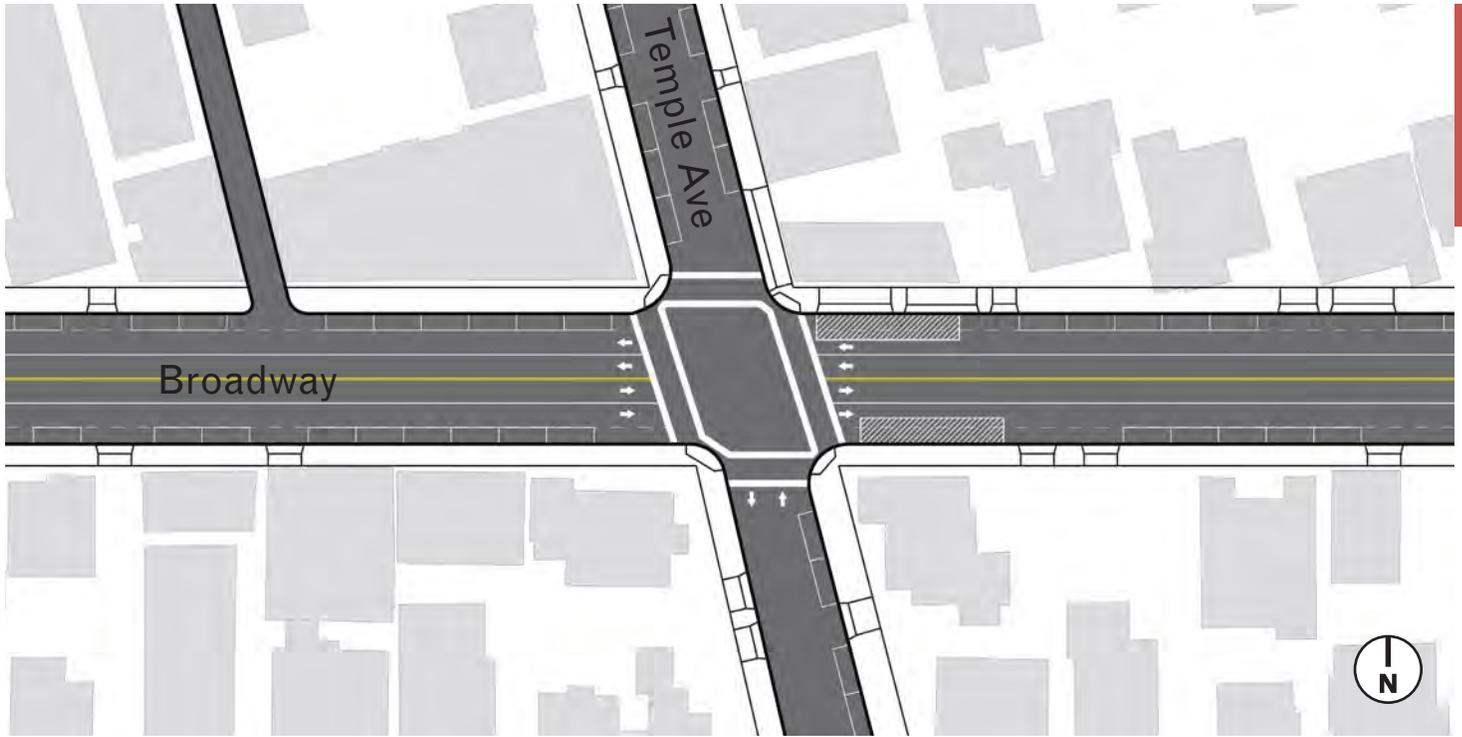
Broadway at Temple Intersection: Existing (77 parking spaces)
